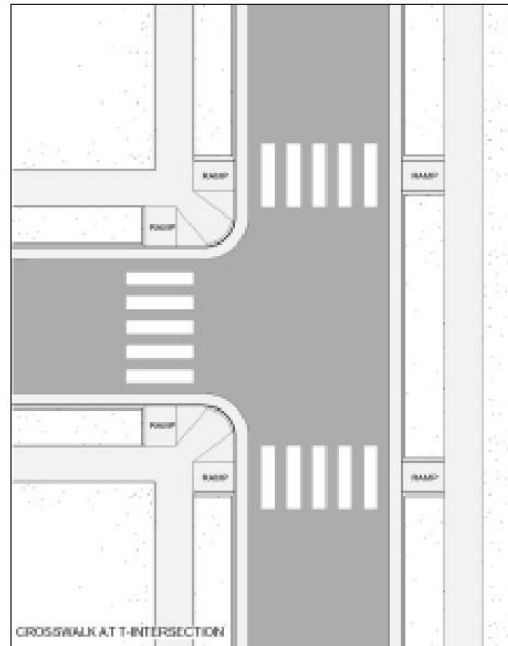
Since legal crosswalks are located at each leg of a T-intersection, so, too, should curb ramps.
